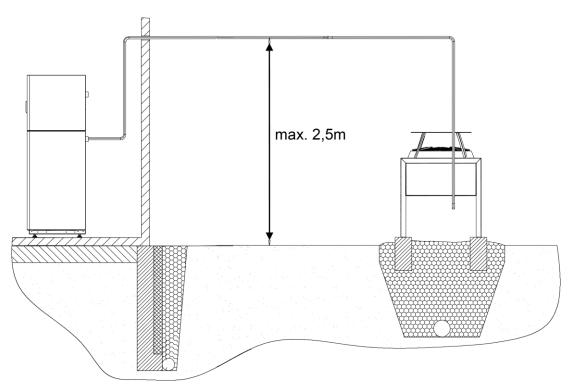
Max. connecting pipework head of 2.5 mm Valid for AIR 80 C13A and AIR 80 C22A
